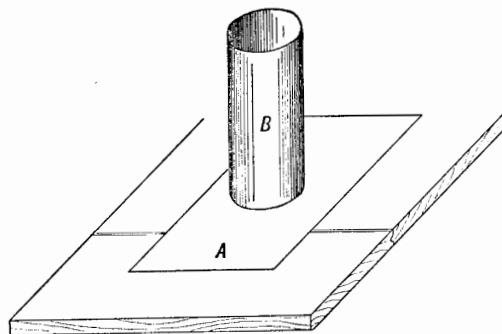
View of Roof Flange and Cylinder on Single Pitch Roof
